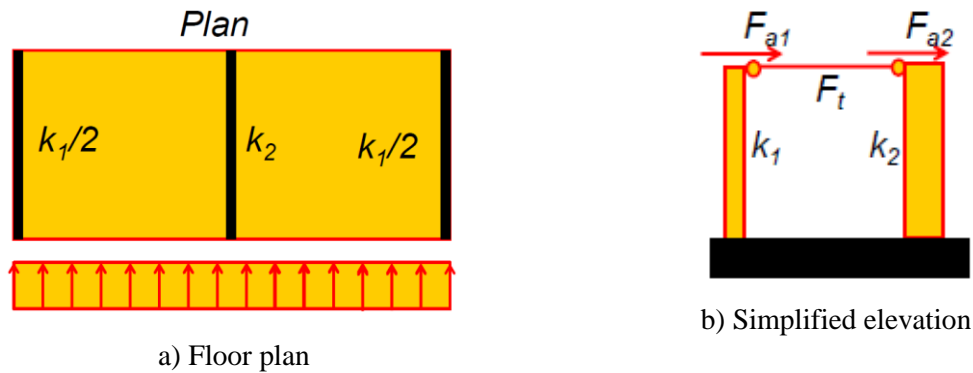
Simple floor plan of one storey building (MacRae and Bull, 2015)
